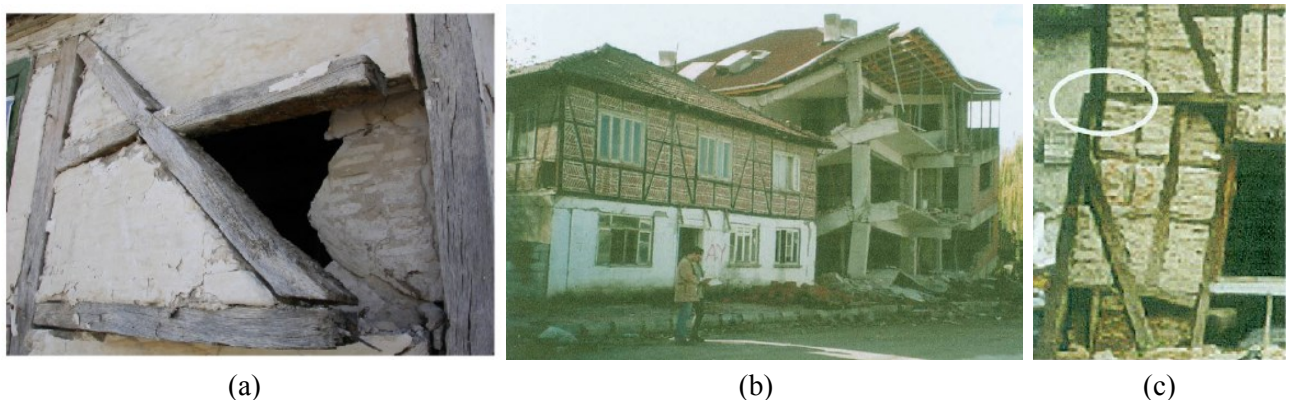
Examples of damages in timber frame buildings; (a) out-of-plane collapse of masonry infill (Lefkada, Greece) [6]; (b) comparison of damages to traditional and modern building after the 1999 Duzce earthquake; (c) failure of connection in timber frame (1999 Kocaeli earthquake [14].
